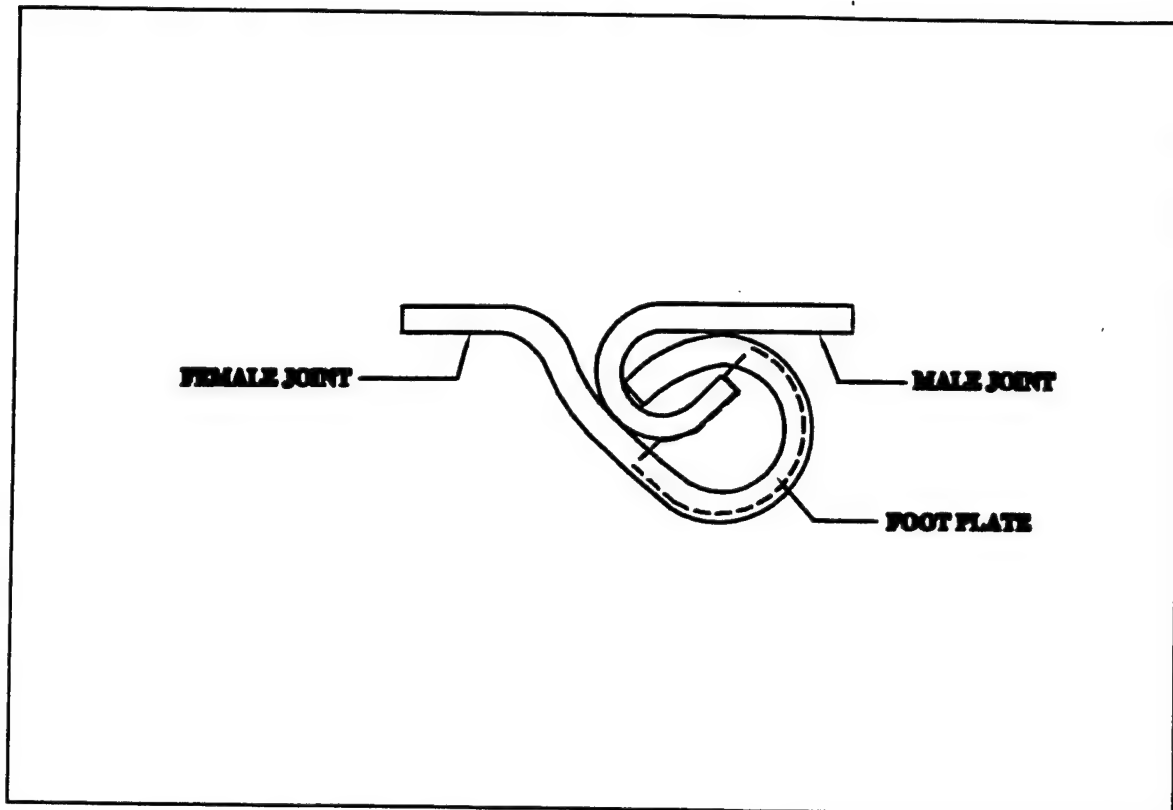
Waterloo Barrier® Sealable Cavity Cross Section
